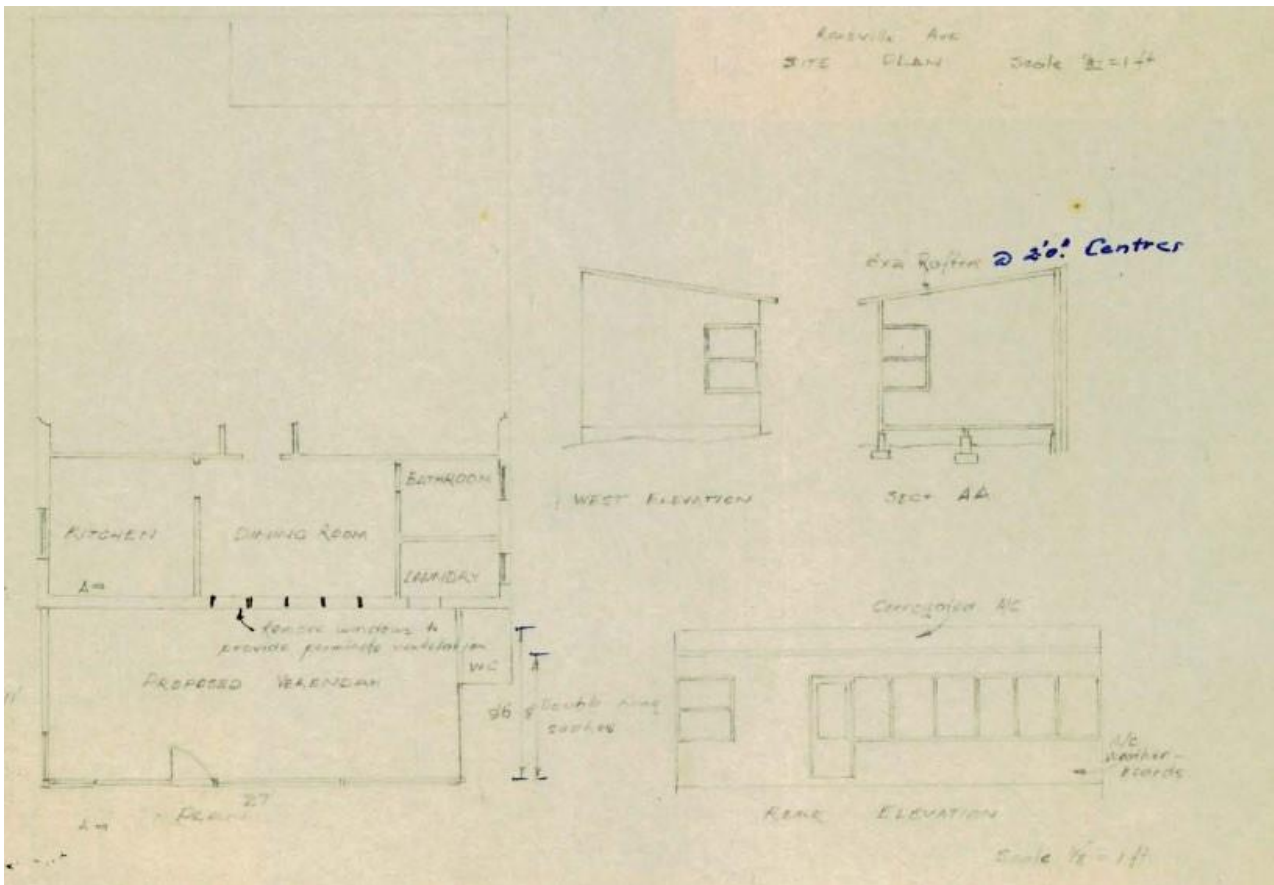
Plans and elevations detailing proposed veranda at rear dating from 1964
